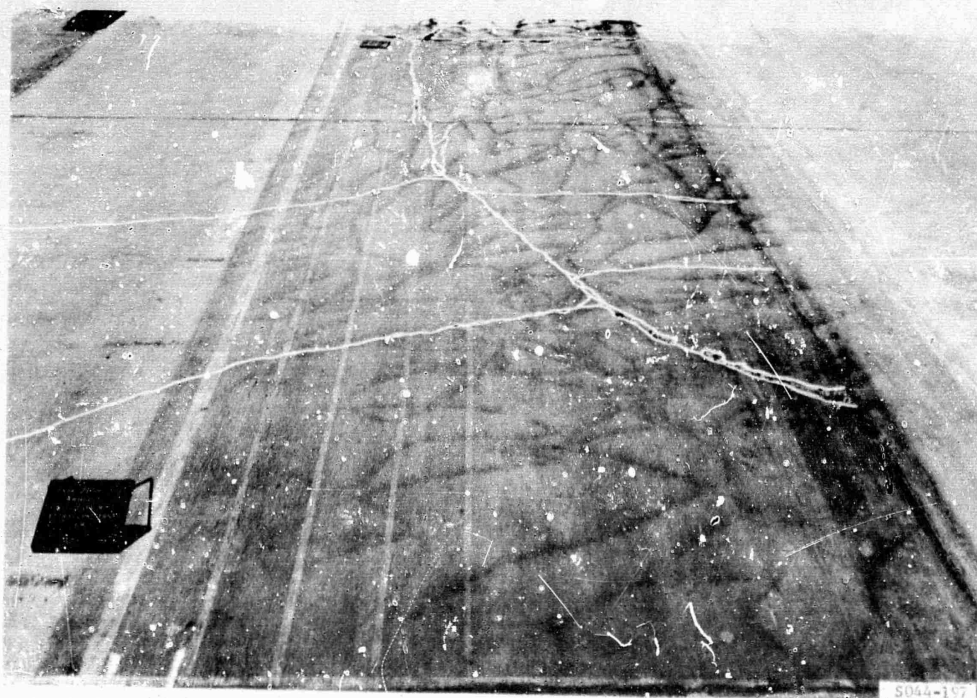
Crack Pattern in Rigid Pavement, Item 1, South Lane, Prior to Placement of Nonrigid Overlay
